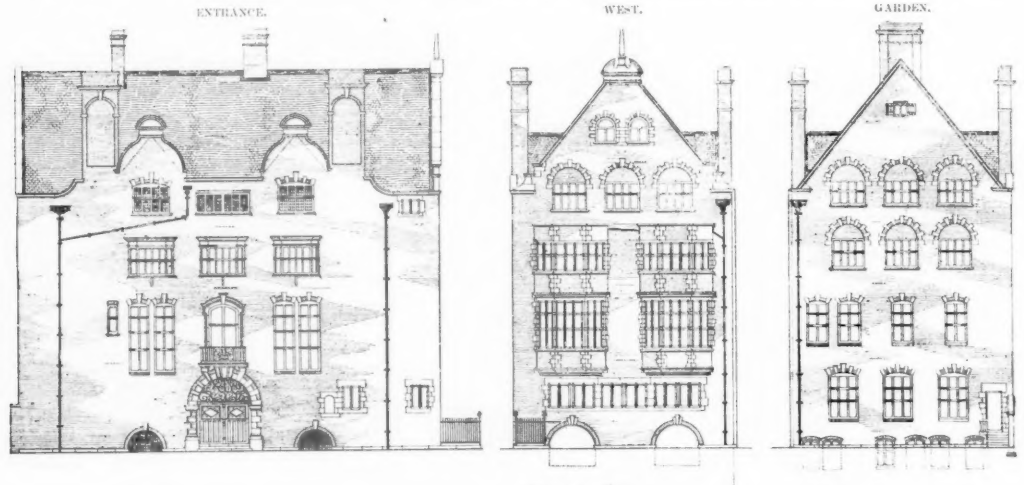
ELEVATIONS OF A CORNER HOUSE AT QUEEN'S GATE. R. NORMAN SHAW, R.A., ARCHITECT, 1891.
